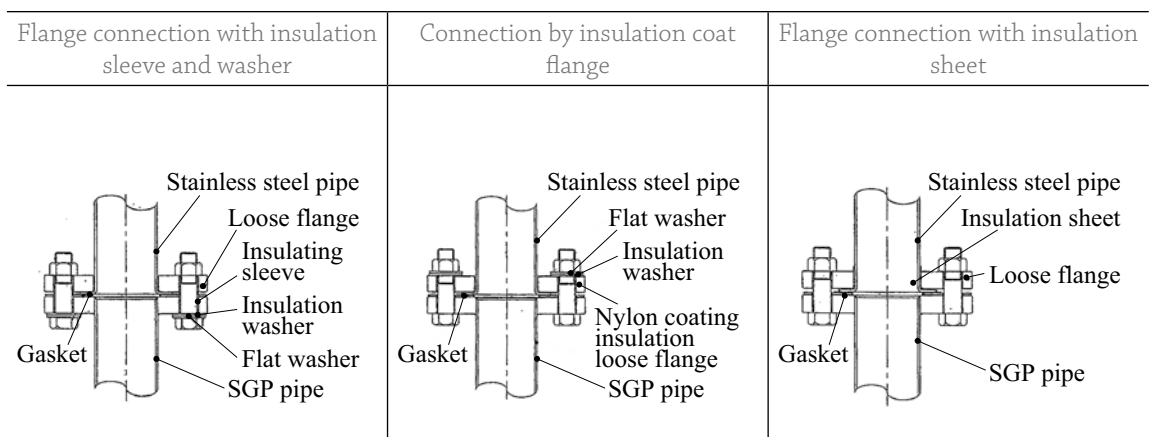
(c) Examples of flange connection (medium and large diameter pipe)⁹
